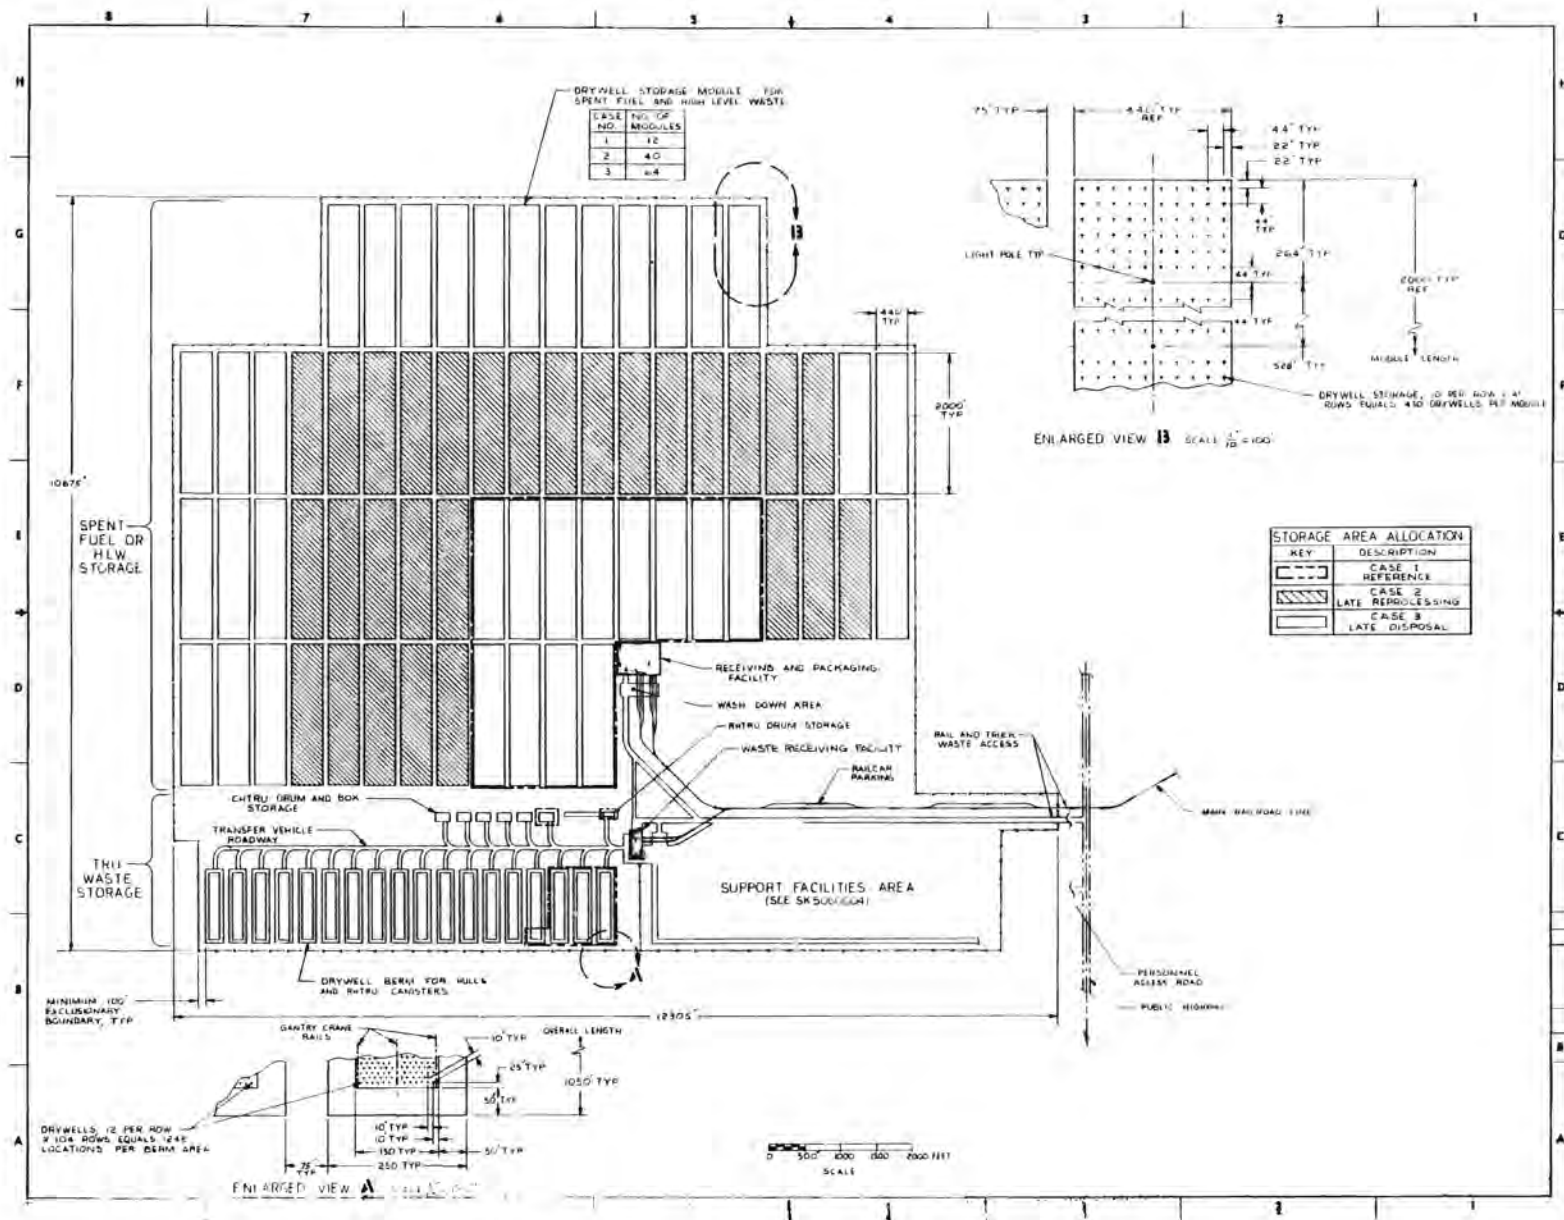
MRS/IS Stand-Alone Facility Drywell Storage Site Plan
